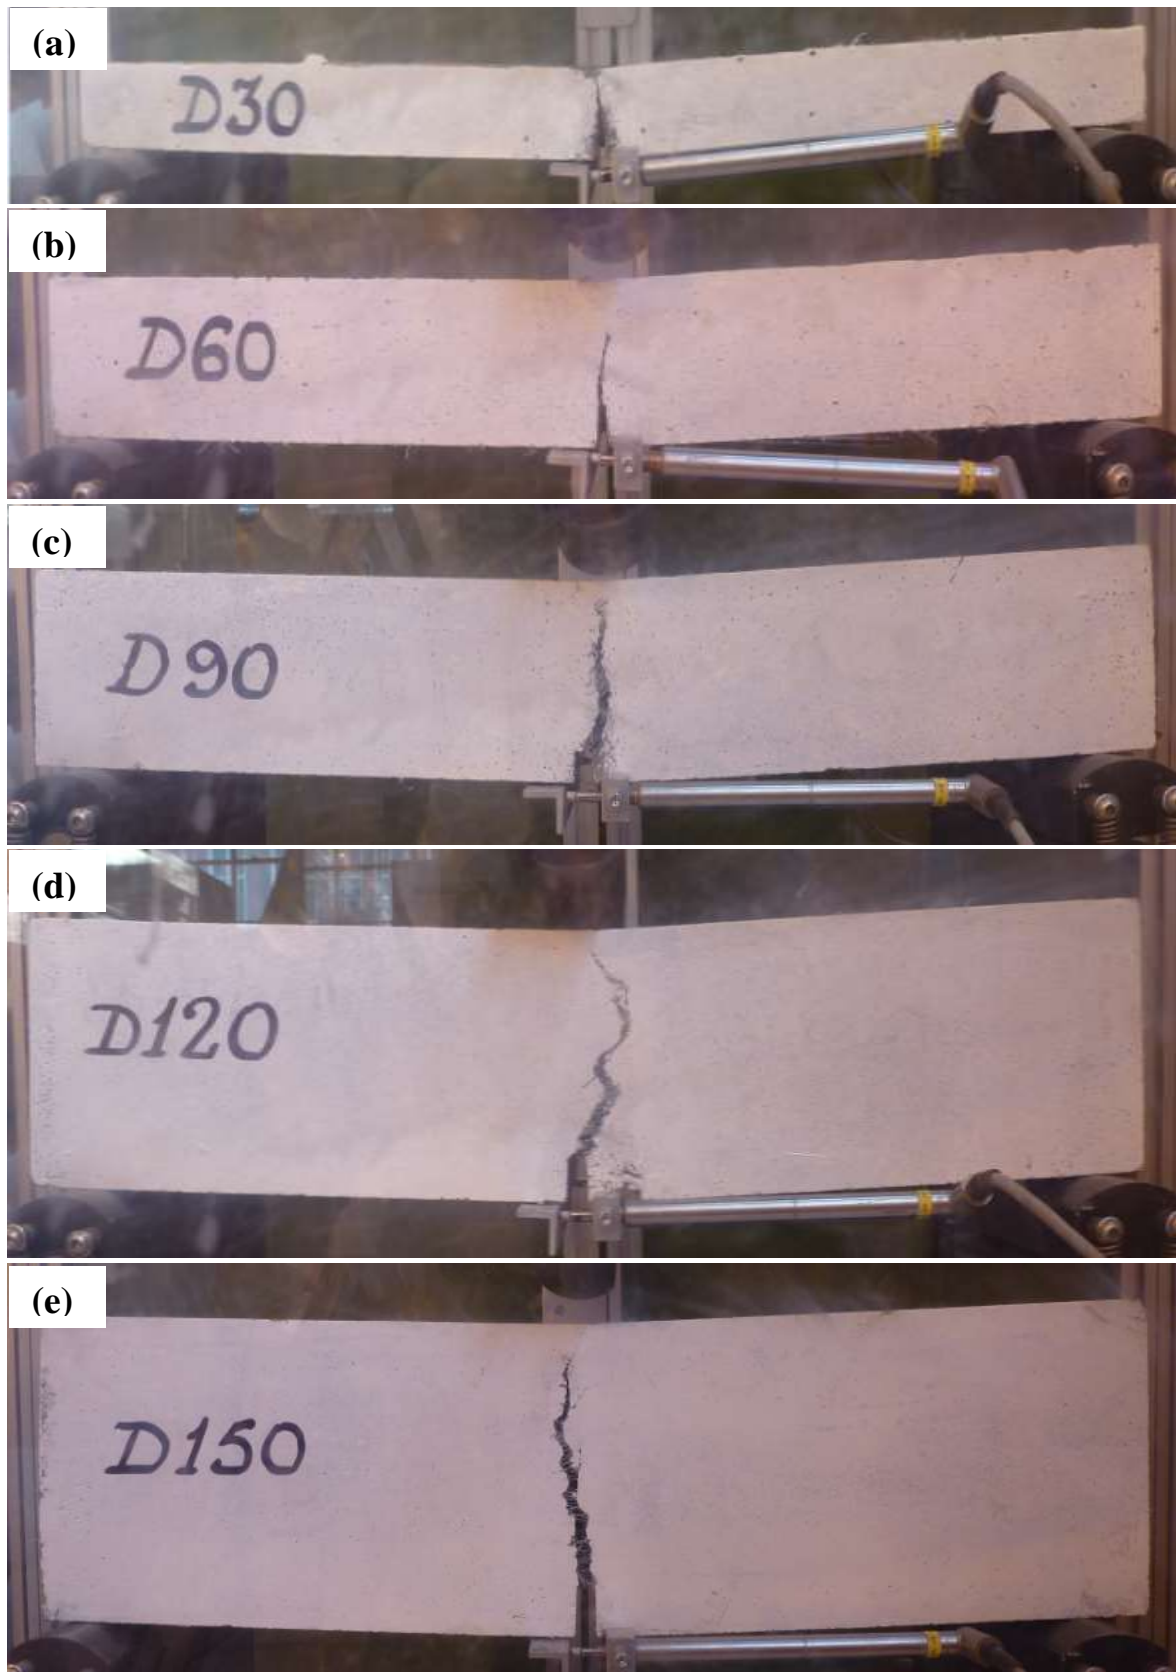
Cracks at failure of 5 beams (a) D30 (b) D60 (c) D90 (d) D120 (e) D150.
